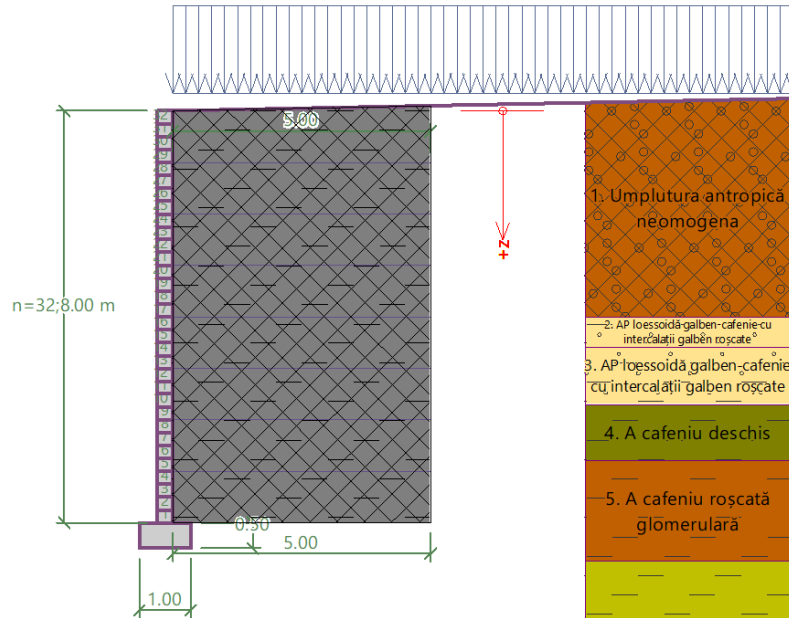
Soil Stratification and Structure Conformation of the Retaining Wall as MSE Wall
